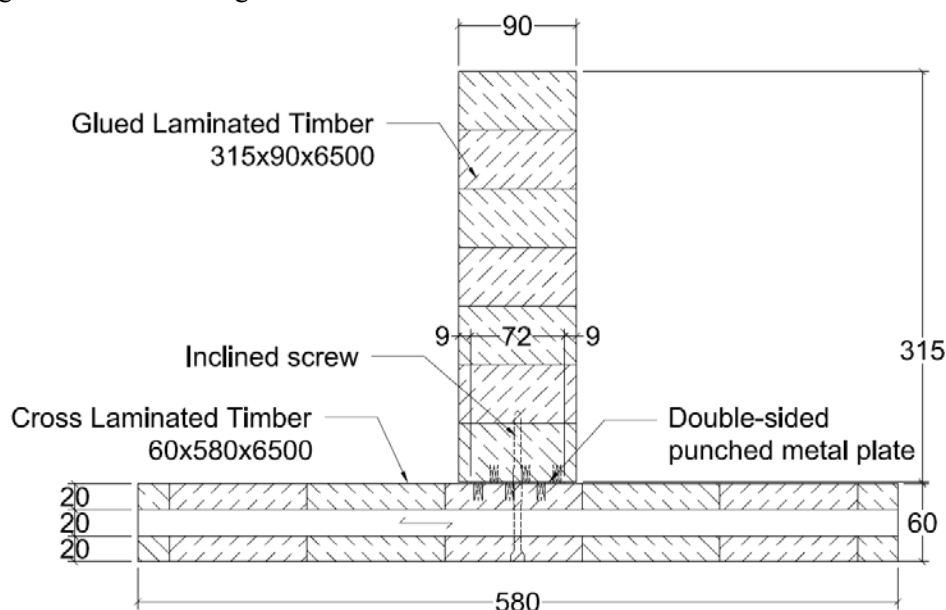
Cross section of the composite glulam-CLT beam with double-sided nail plate and inclined screw shear connection (dimensions in mm).
